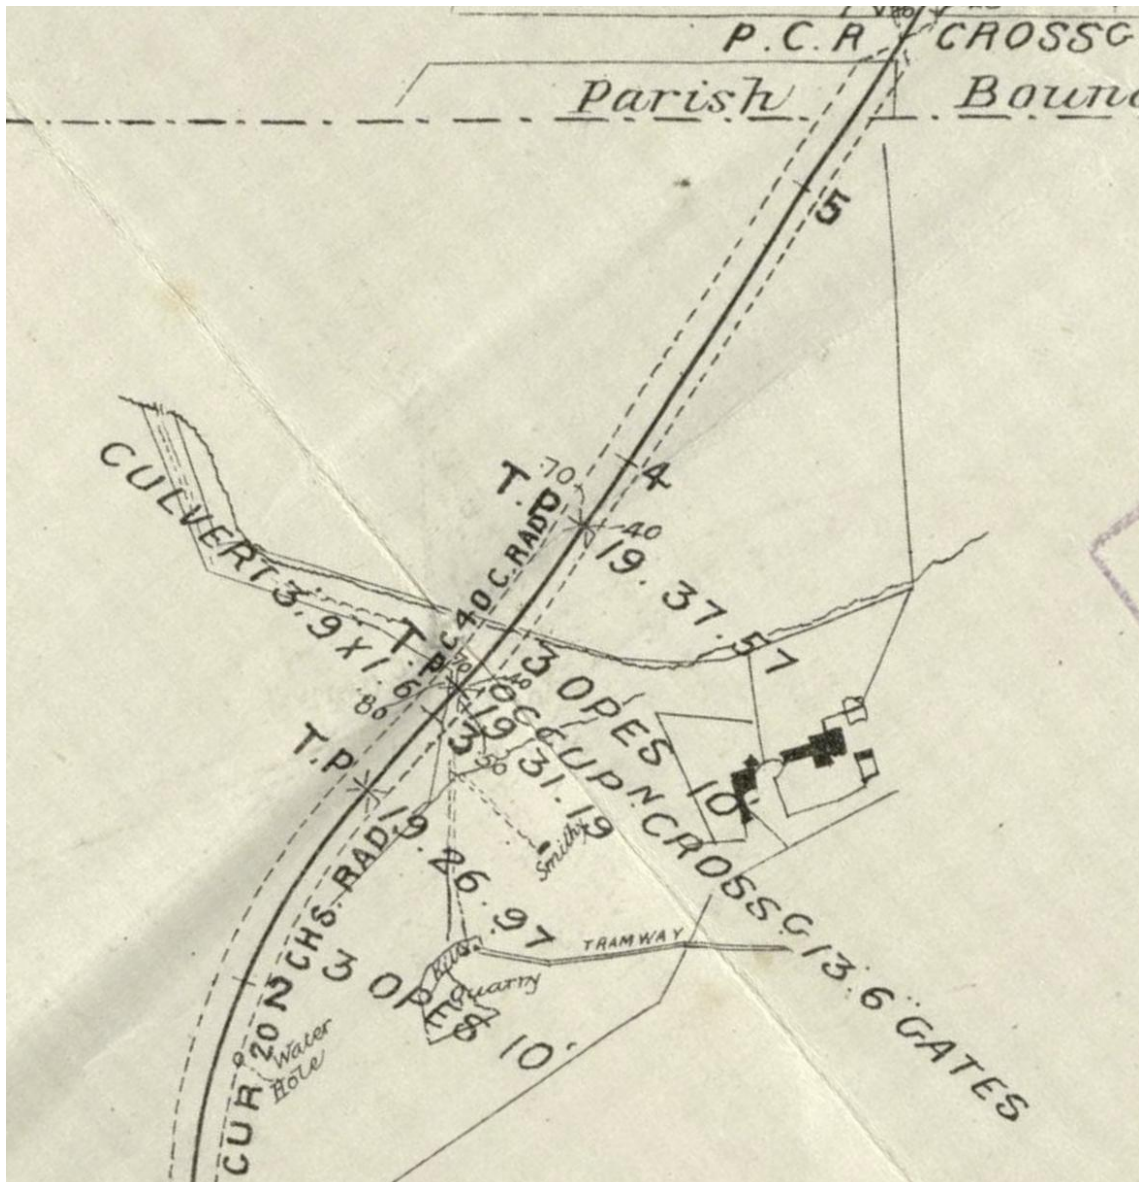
Victorian Railways plan of route of Lilydale railway line, late 1880s, showing buildings at Cave Hill including a smithy, and two larger buildings, which possibly include the homestead the quarry and kilns are indicated at bottom centre
